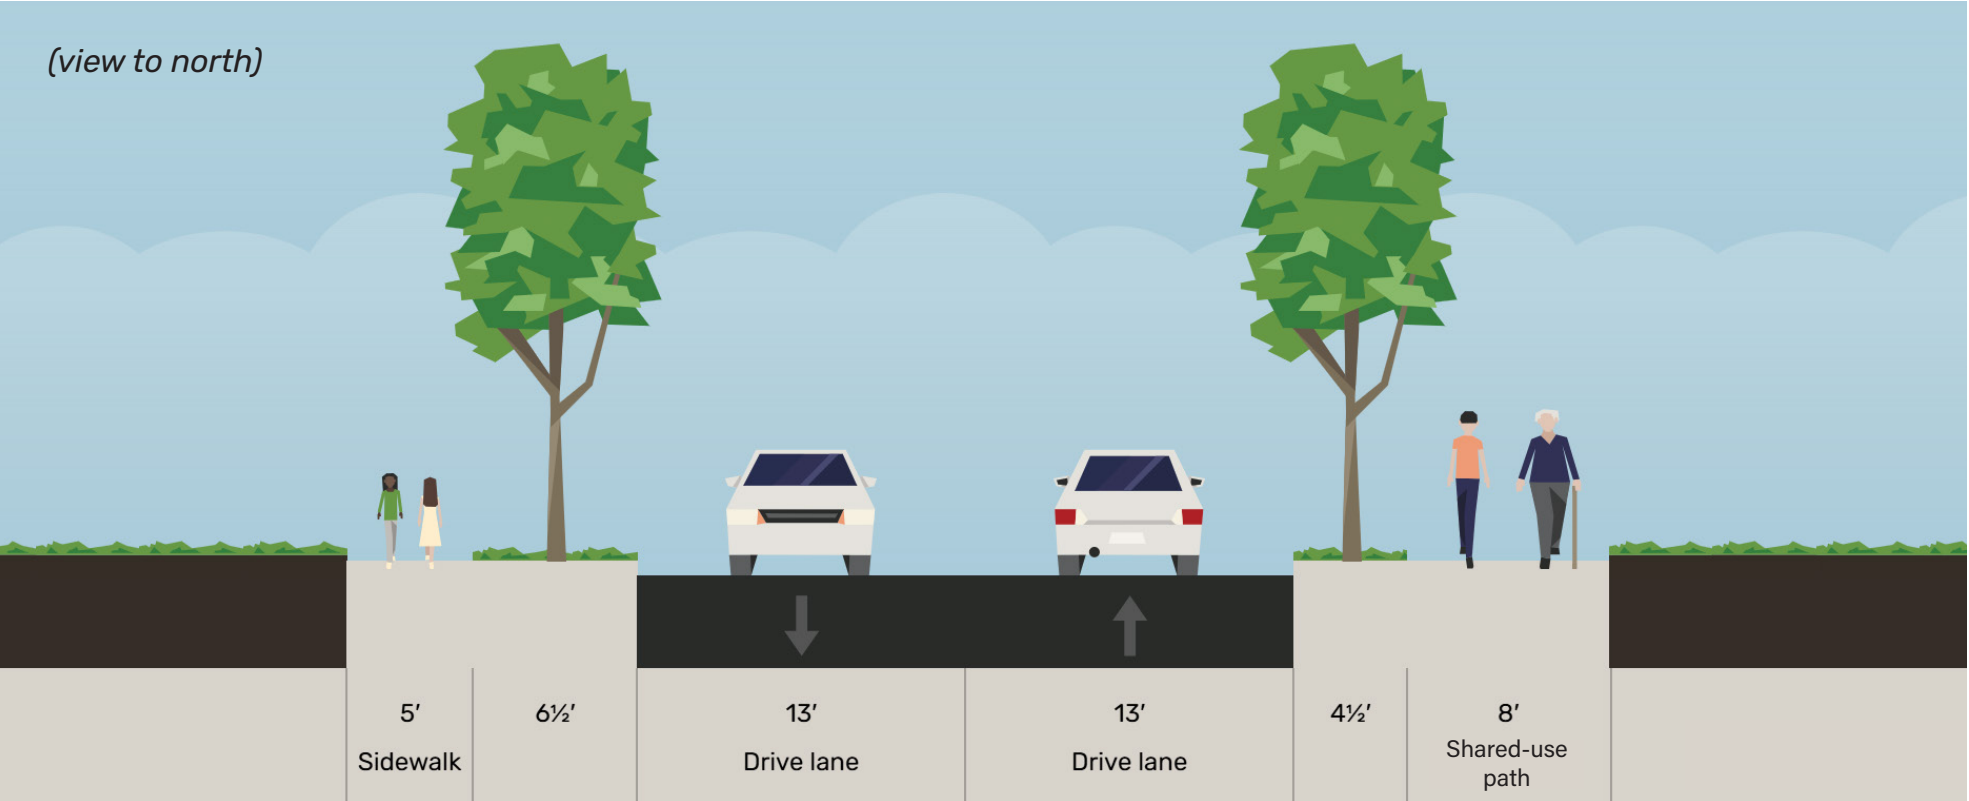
Proposed Typical Cross-Section on Vintage Drive (50’ ROW)
